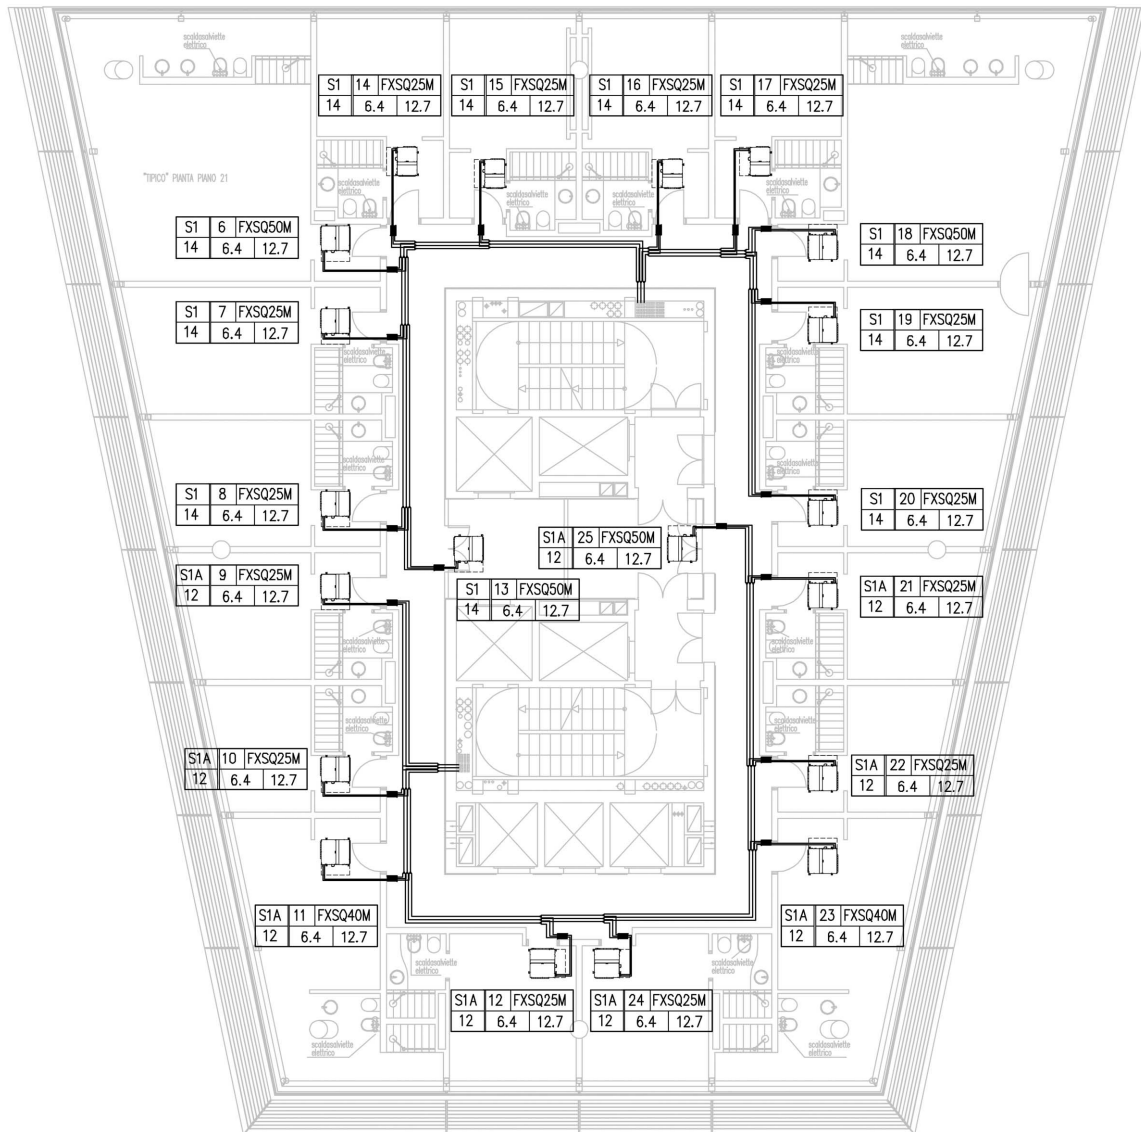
Acciaio Bldg. Hotel Typical Floor Plan
